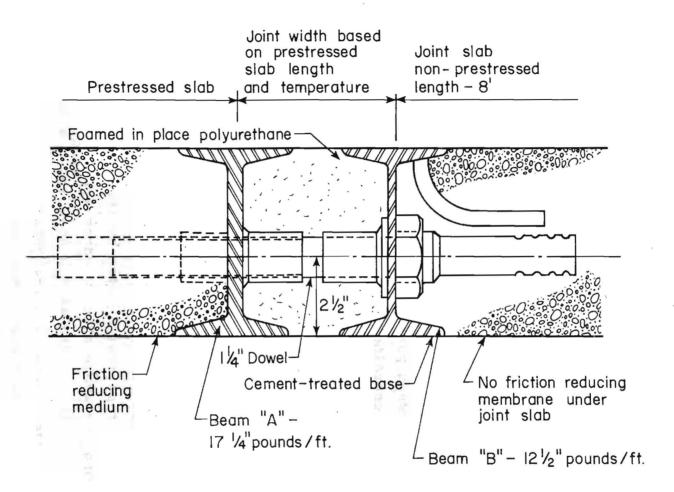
JOINT DETAIL FOR PRESTRESSED PAVEMENT AT DULLES INTERNATIONAL AIRPORT, VIRGINIA
